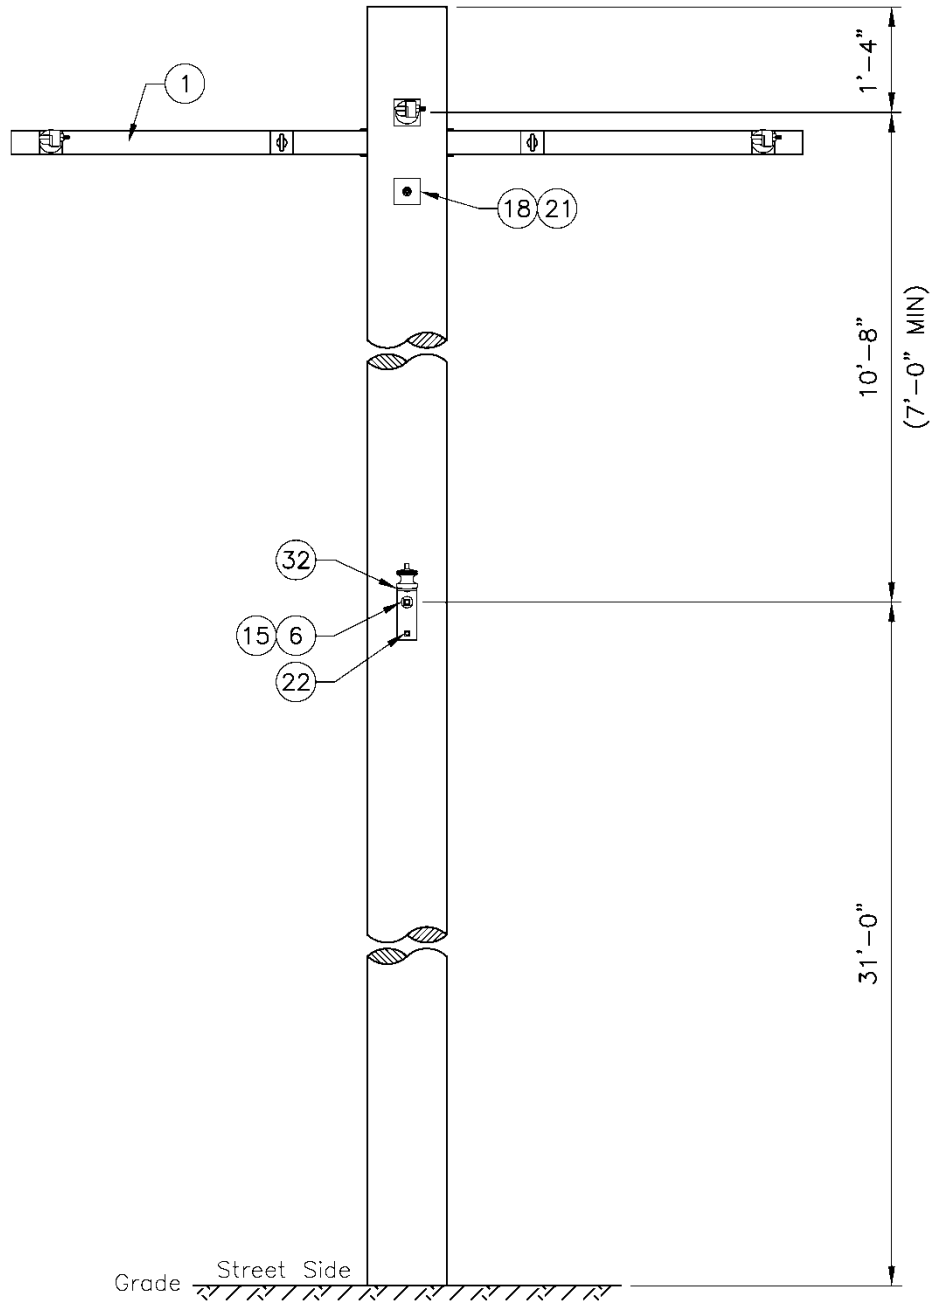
Three-Phase 397.5 and 954 kcmil ACSR Single Deadend Pole Top Assembly, Side View
